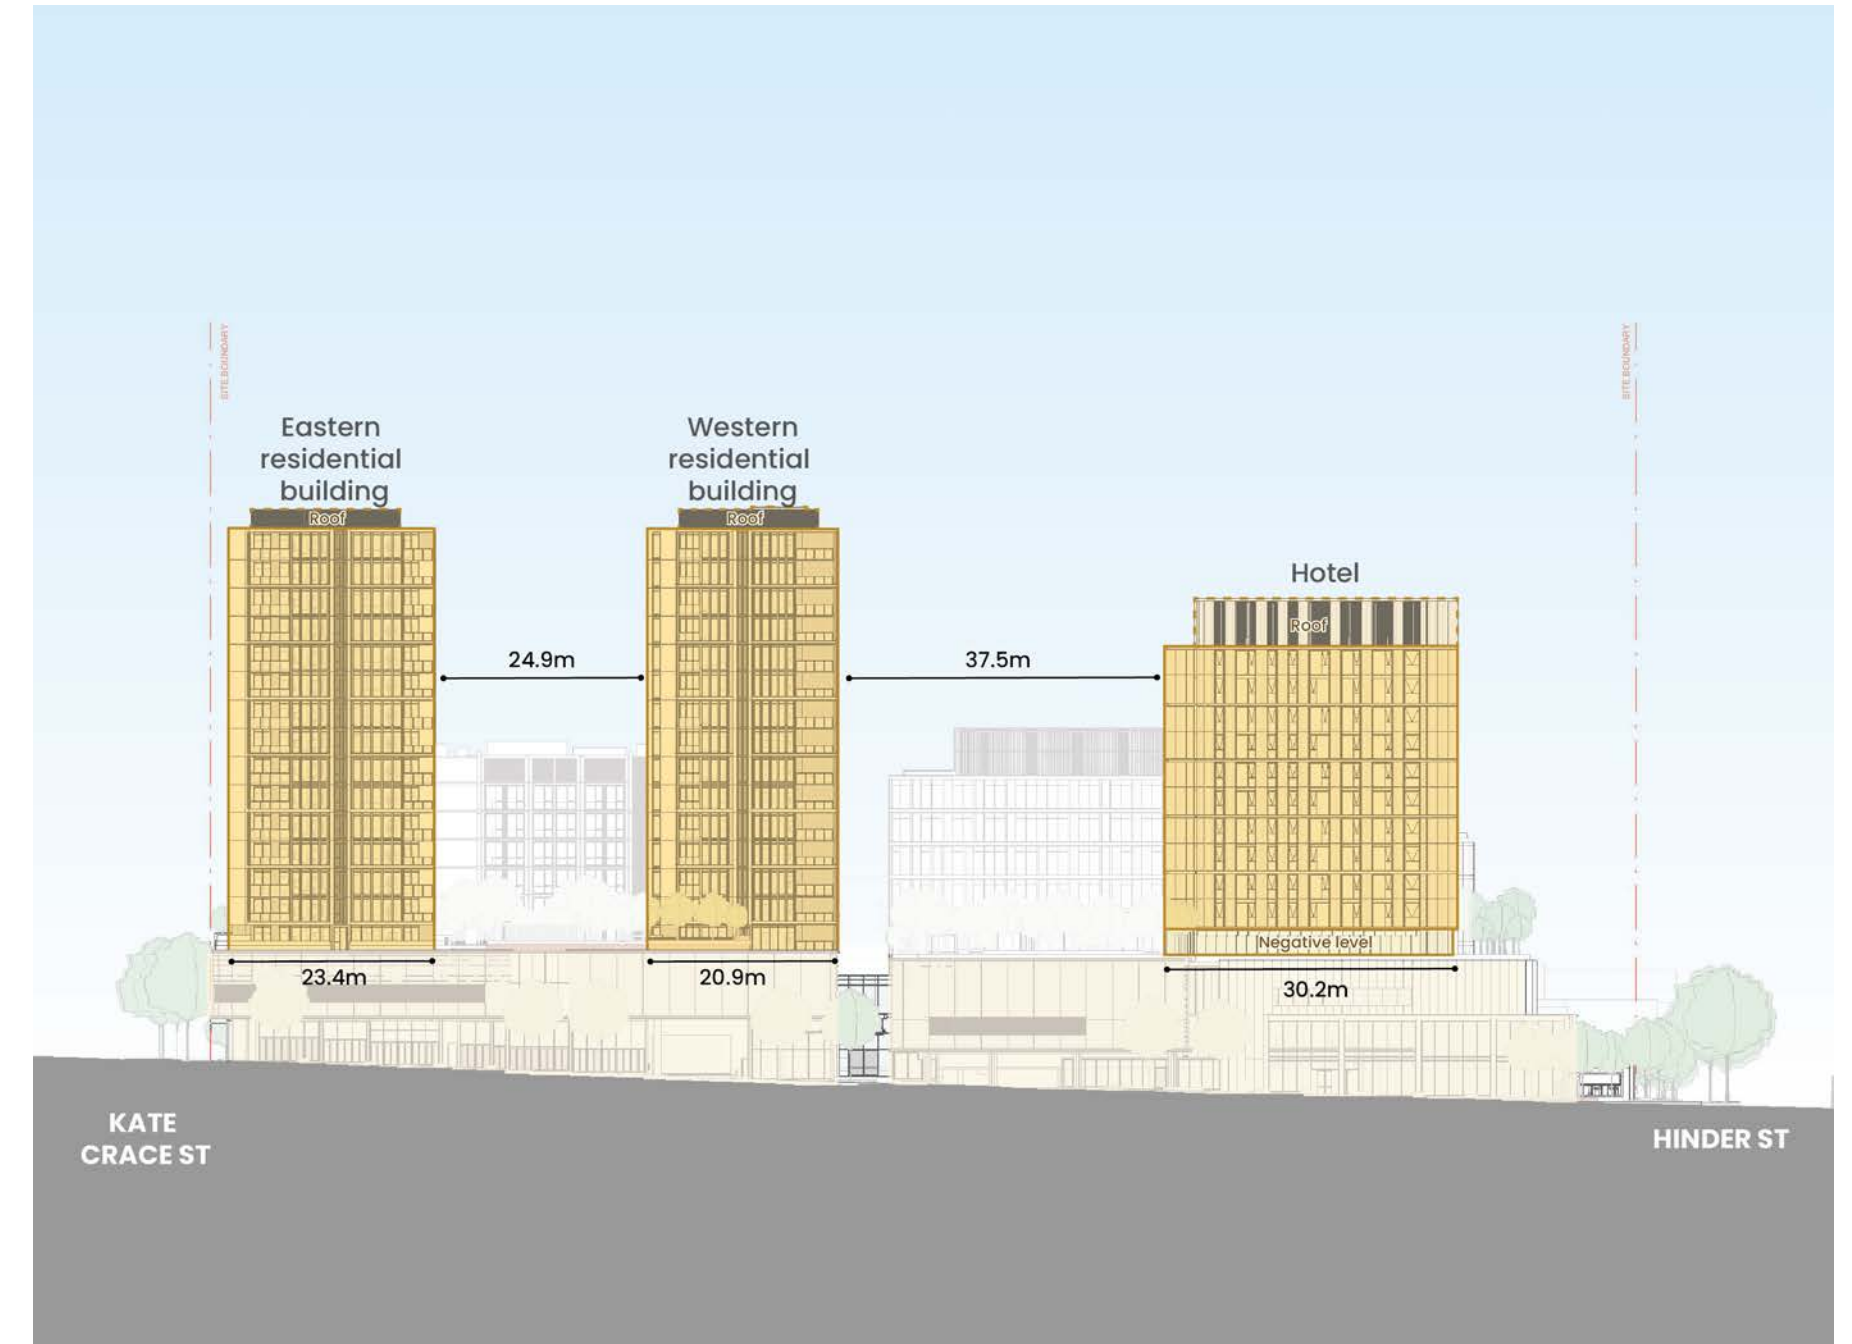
Ernest Cavanagh Street elevation with the building response highlighted (Source: COX, with annotations)
